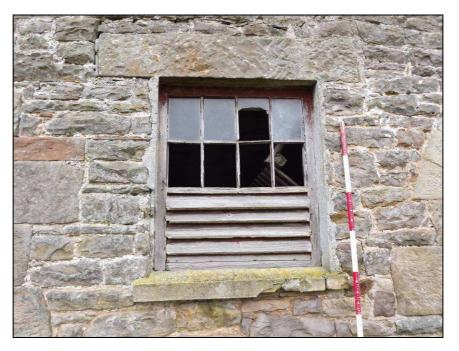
Detail of one of the ground floor windows, south elevation of Building A
